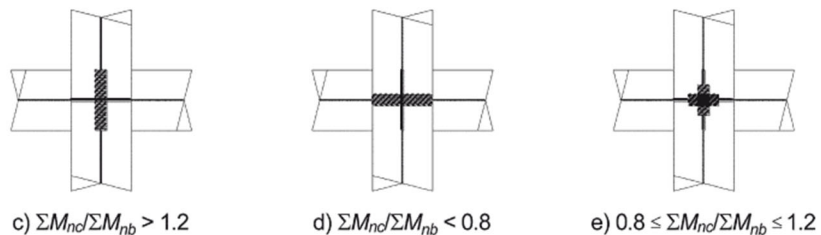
Part of Figure 10-2 from ASCE-41 Section 10.4.2.2, demonstrating the simplified joint region models for beam-column joints. The various recommendations based on column to beam moment capacity ratios are shown in the three joint
